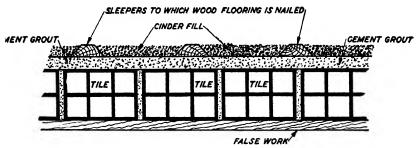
Cross Section of Floor Construction, Using Hollow Tile
